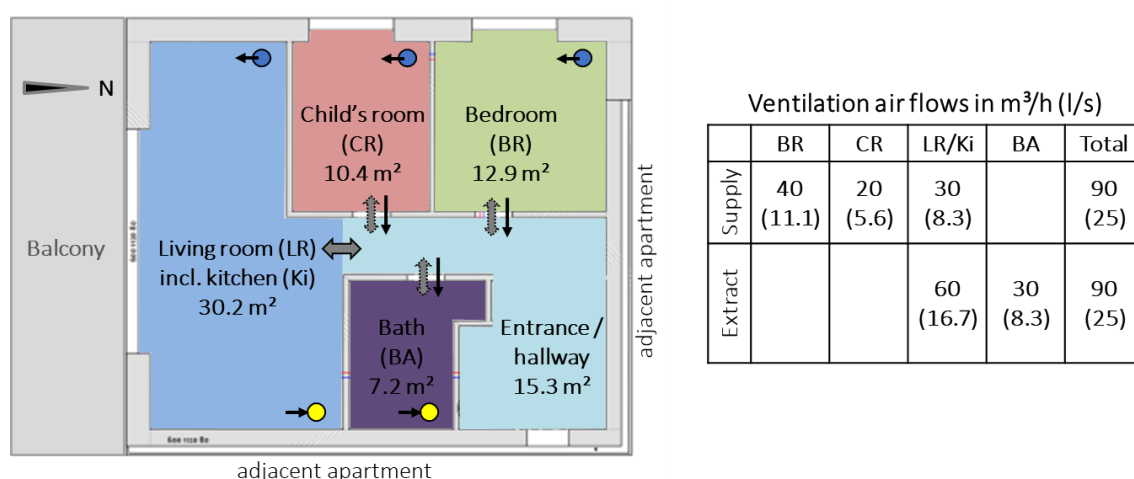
Sketch of the simulated floor plan representing a typical new Austrian residential dwelling and the ventilation air flows as modelled in the reference model.
